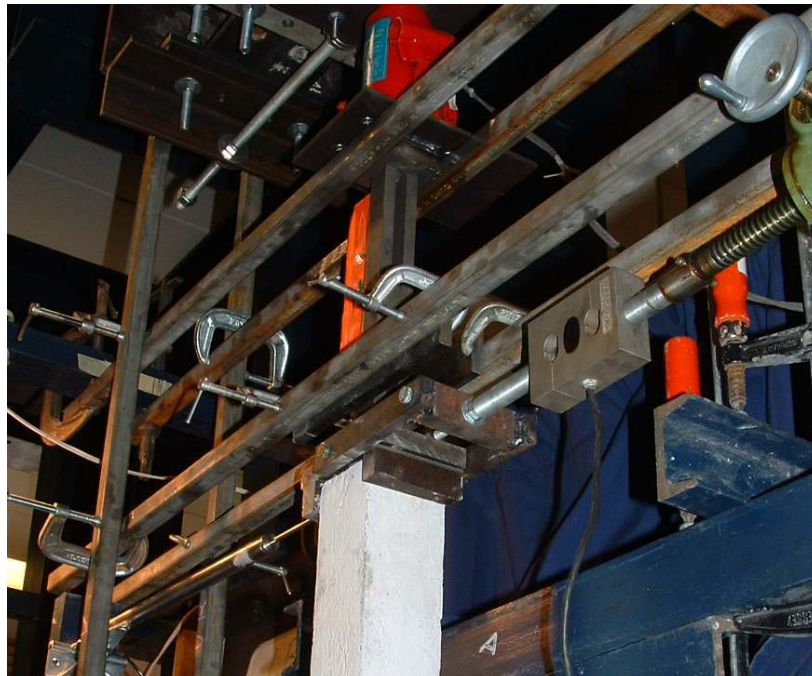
Lateral Bracing System Used for Large-Scale Model 10-mm DHFRP R/C Columns.
